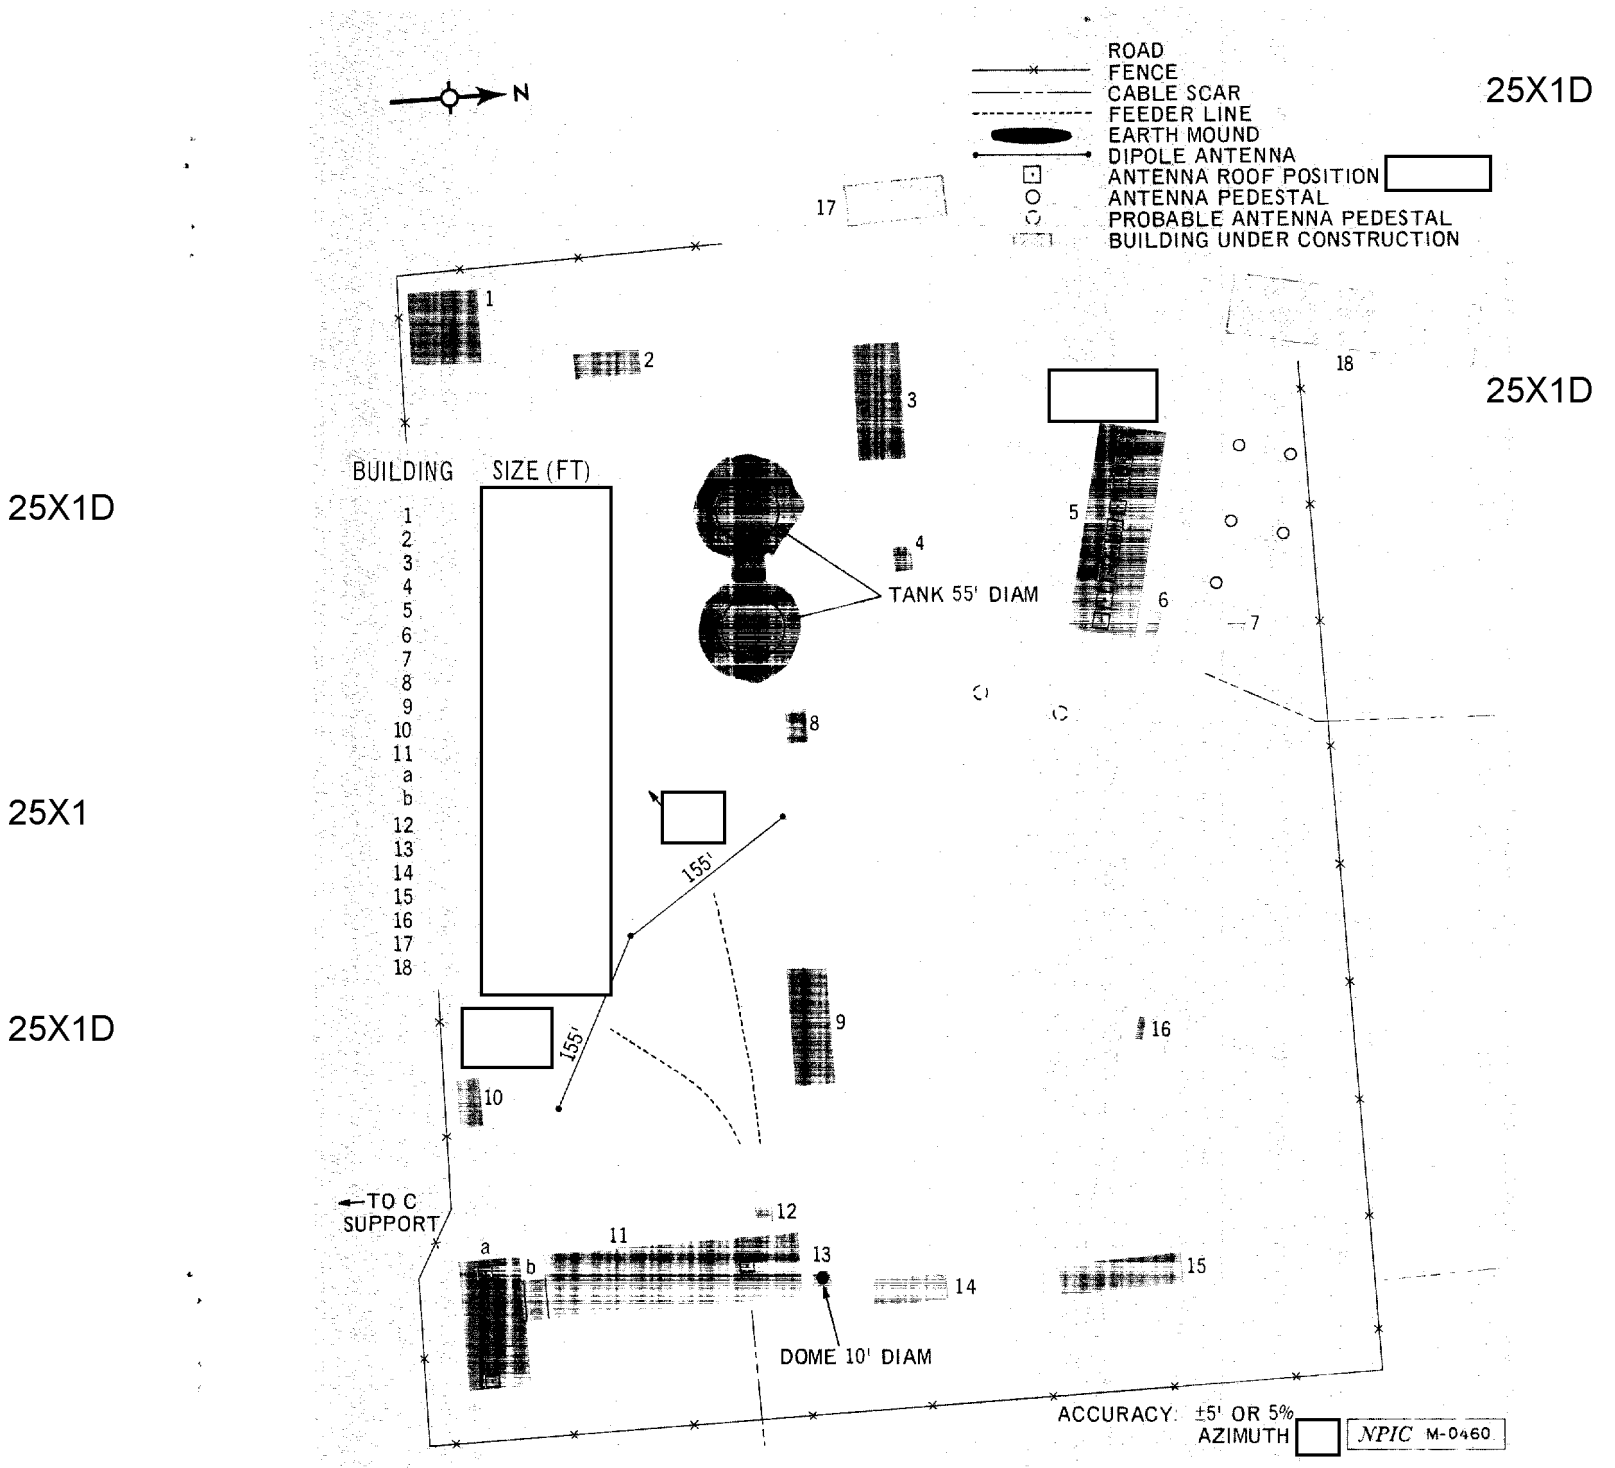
LAYOUT OF LAUNCH COMPLEX C TRACKING FACILITY,
